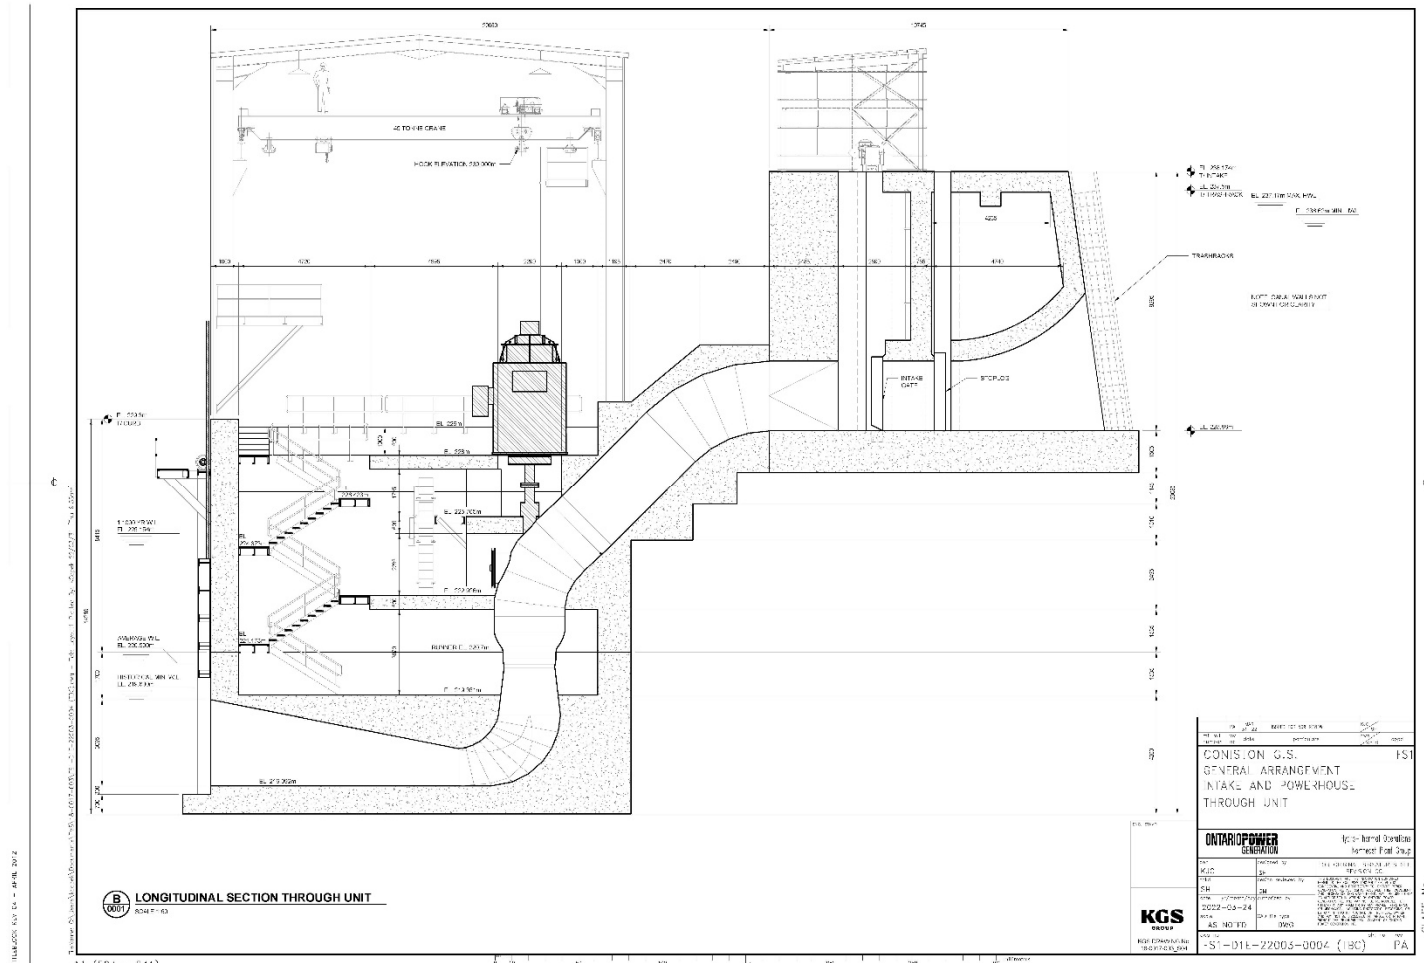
Proposed Powerhouse Longitudinal Section of Intake and Powerhouse Thorough Unit
